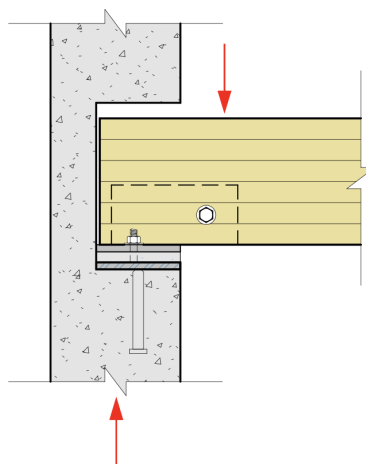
Connection with a beam in a wall notch. Taken from WoodWorks (2021)
